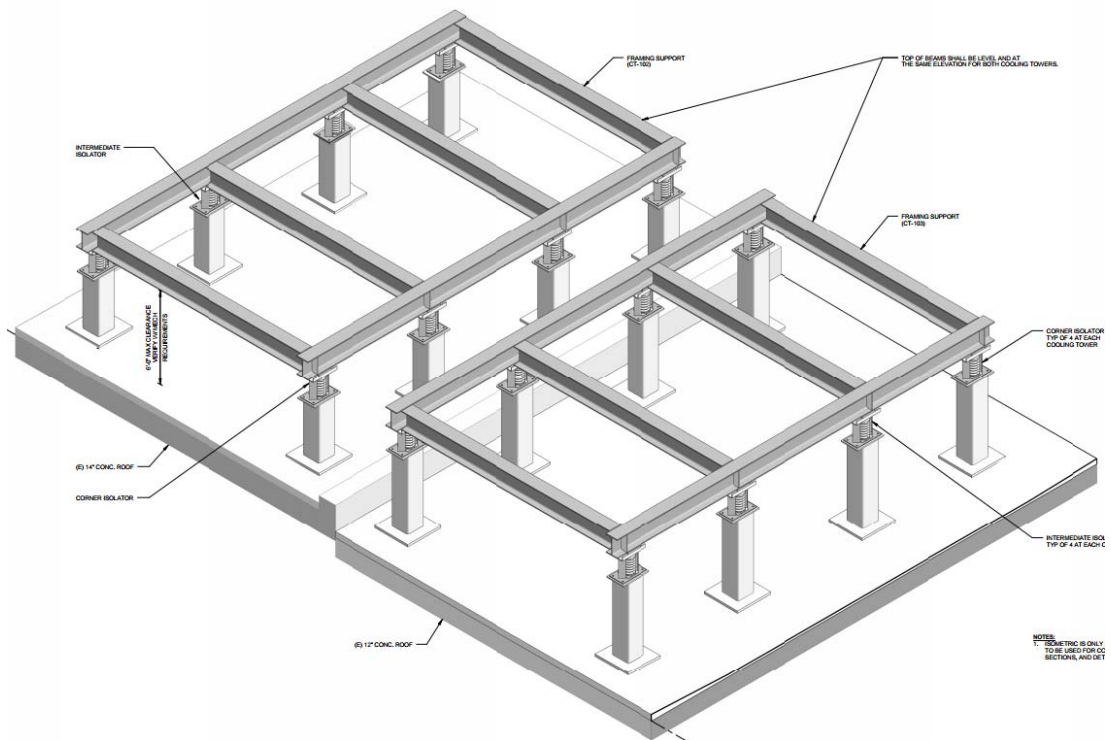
Steel Structure on Design Drawing Issued for Bid (YEI 2016)
